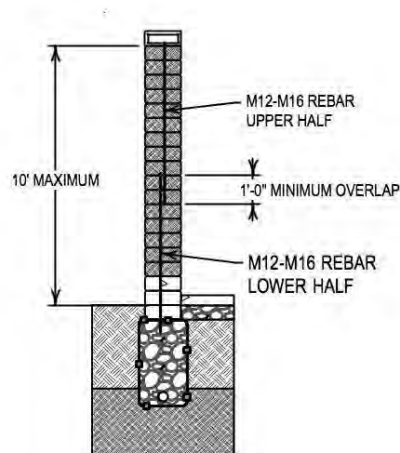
Vertical Reinforcement (Sectional View) Geiger O., (2015, September).
